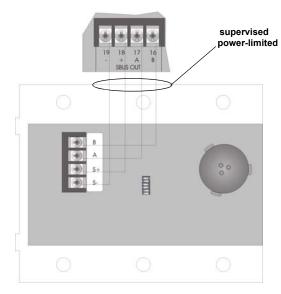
TR-5865-3 or TR5864-4 Connection to the FACP
